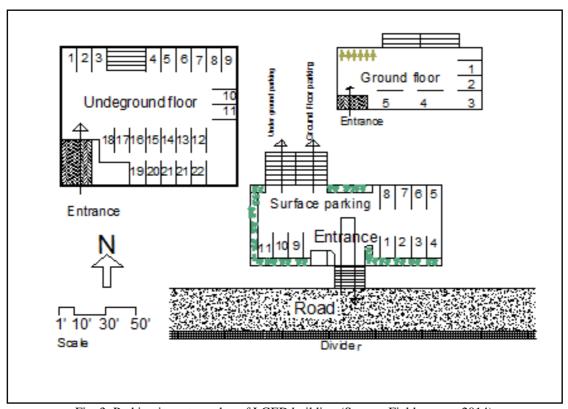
Parking inventory plan of LGED building (Source: Field survey, 2014)
